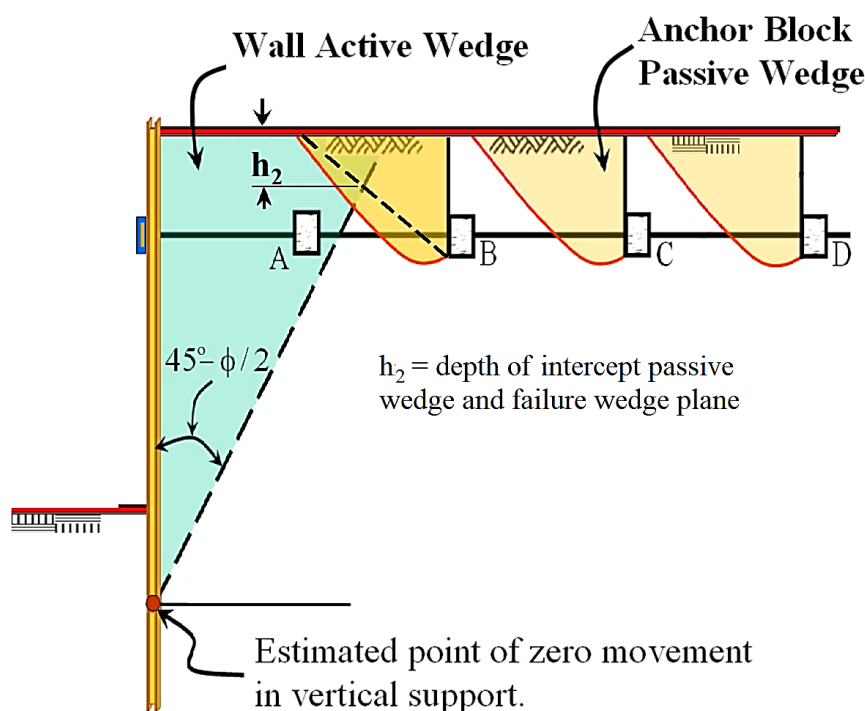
Anchor Block Position Relative to Wall Face and Failure Plain
